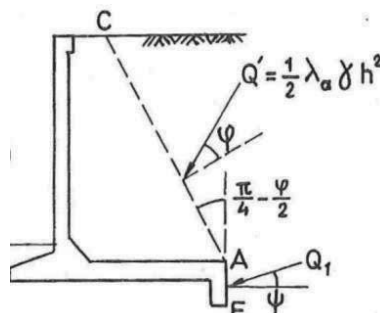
Alternative design rupture surface C-A-E of a L-shaped cantilever wall (after Vandepitte, 1979).
